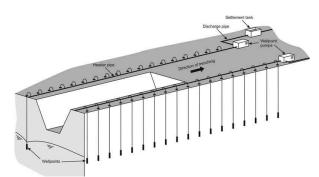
Step 2: Preparation of an Open Construction Pit with Drainage (Deloney, 2023)
